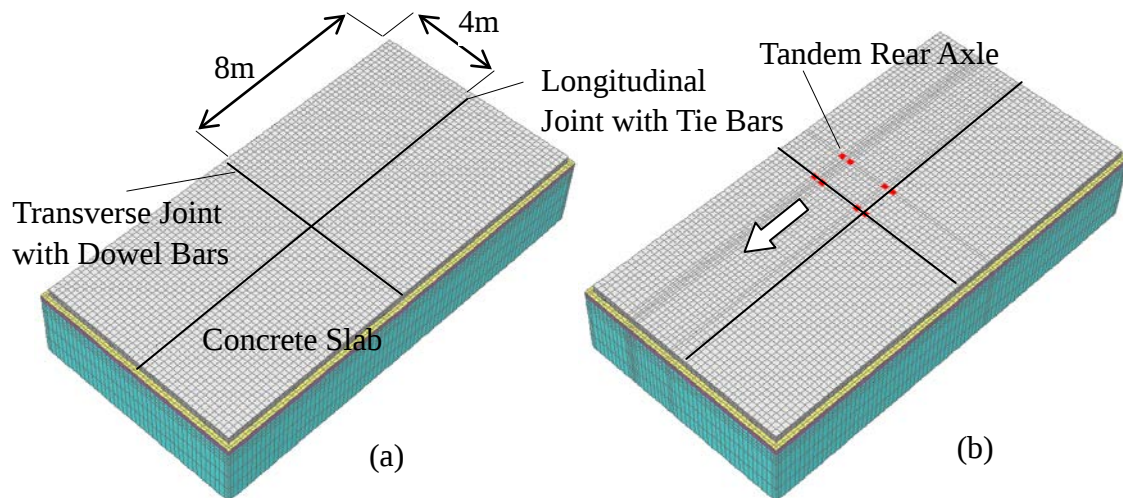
3DFEM modeling of concrete pavement for a heavy duty road: (a) thermal loading and (b) wheel loading
